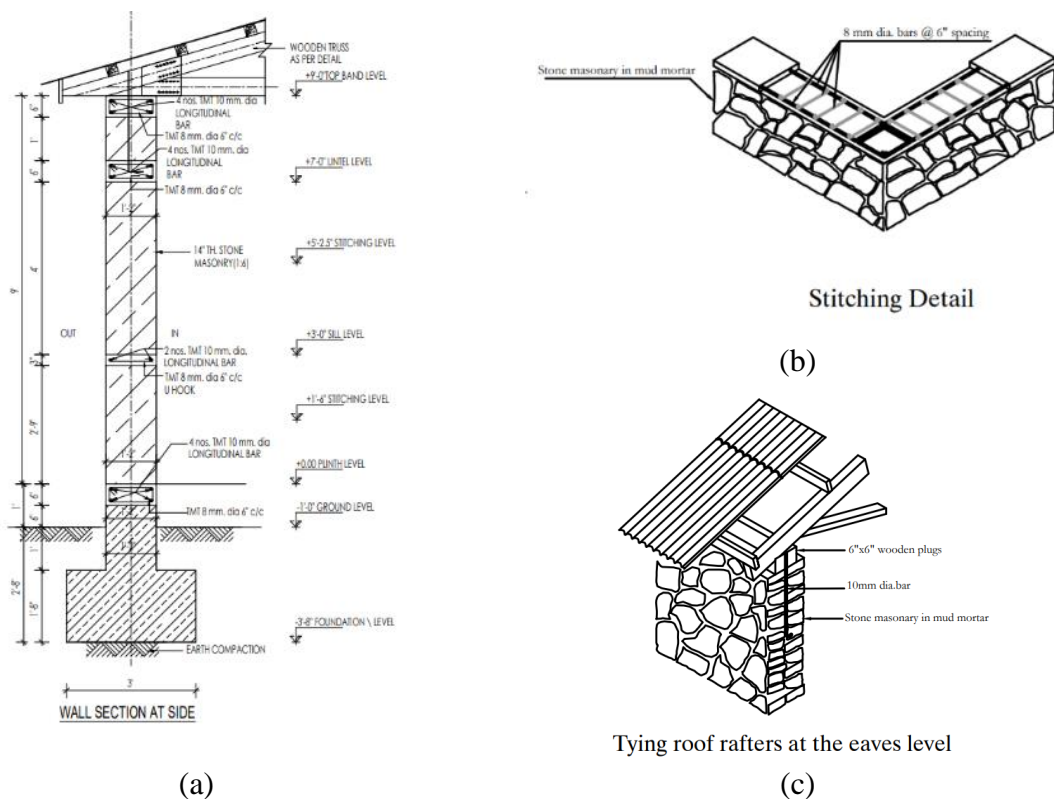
3: (a) Section of the masonry wall with RC bands and roof connection (b) Detail of RC band at sill level (c) Detail of connection of timber roof and wall.
